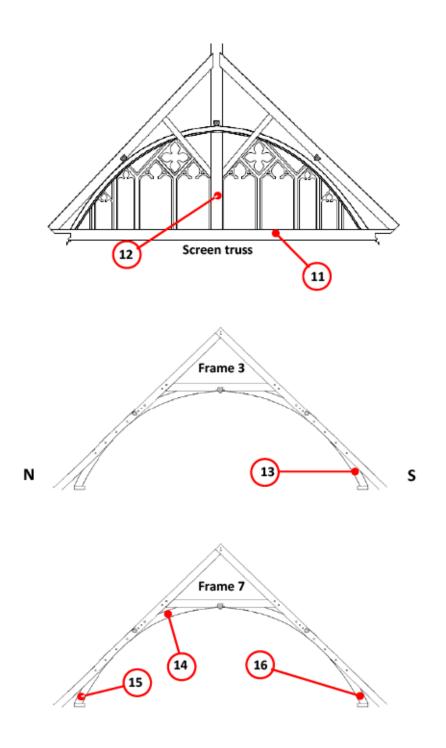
The nave roof trusses to show sampled timbers (after Baart Harries Newall, Architects, Shrewsbury)
